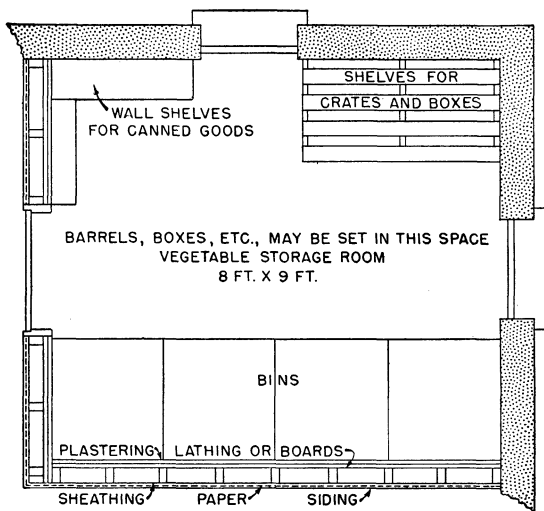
Floor plan of a storage room in a corner of a basement. The arrangement of the shelving and bins may be changed to suit conditions. While the wall construction may be varied, it must be tight.
